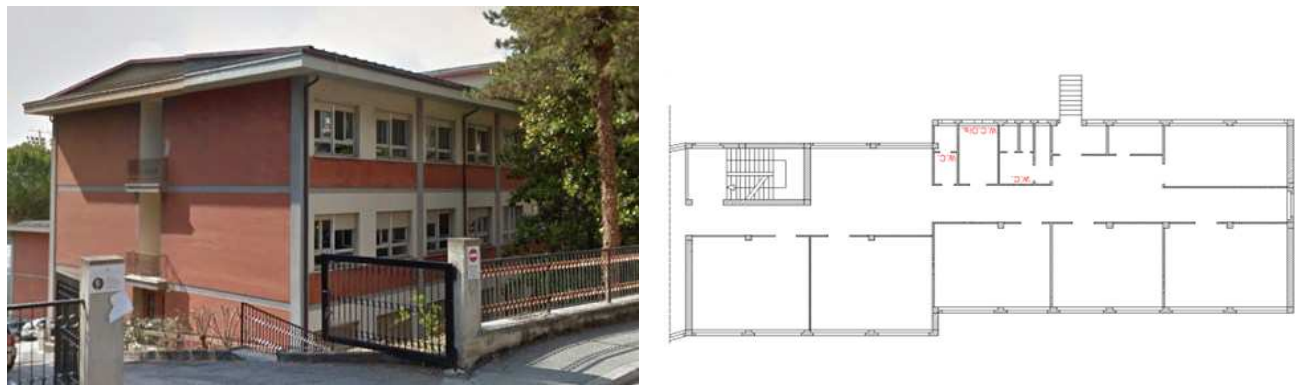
Lateral view (left) and plan shape (right) of the school
